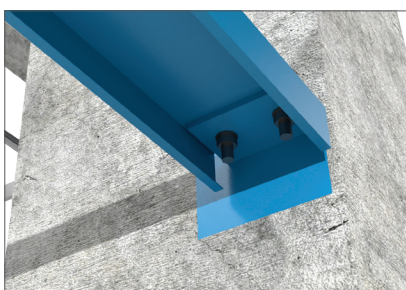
Detail of the longitudinal trimmer connection to a concrete element by means of an angle piece welded to a steel plate located in the concrete element
